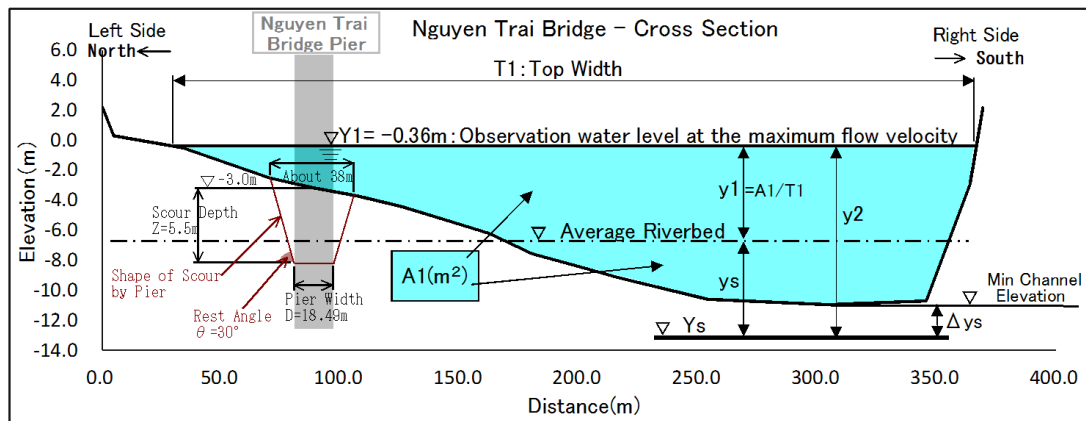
Substructure of Nguyen Trai Bridge – Cross Section
